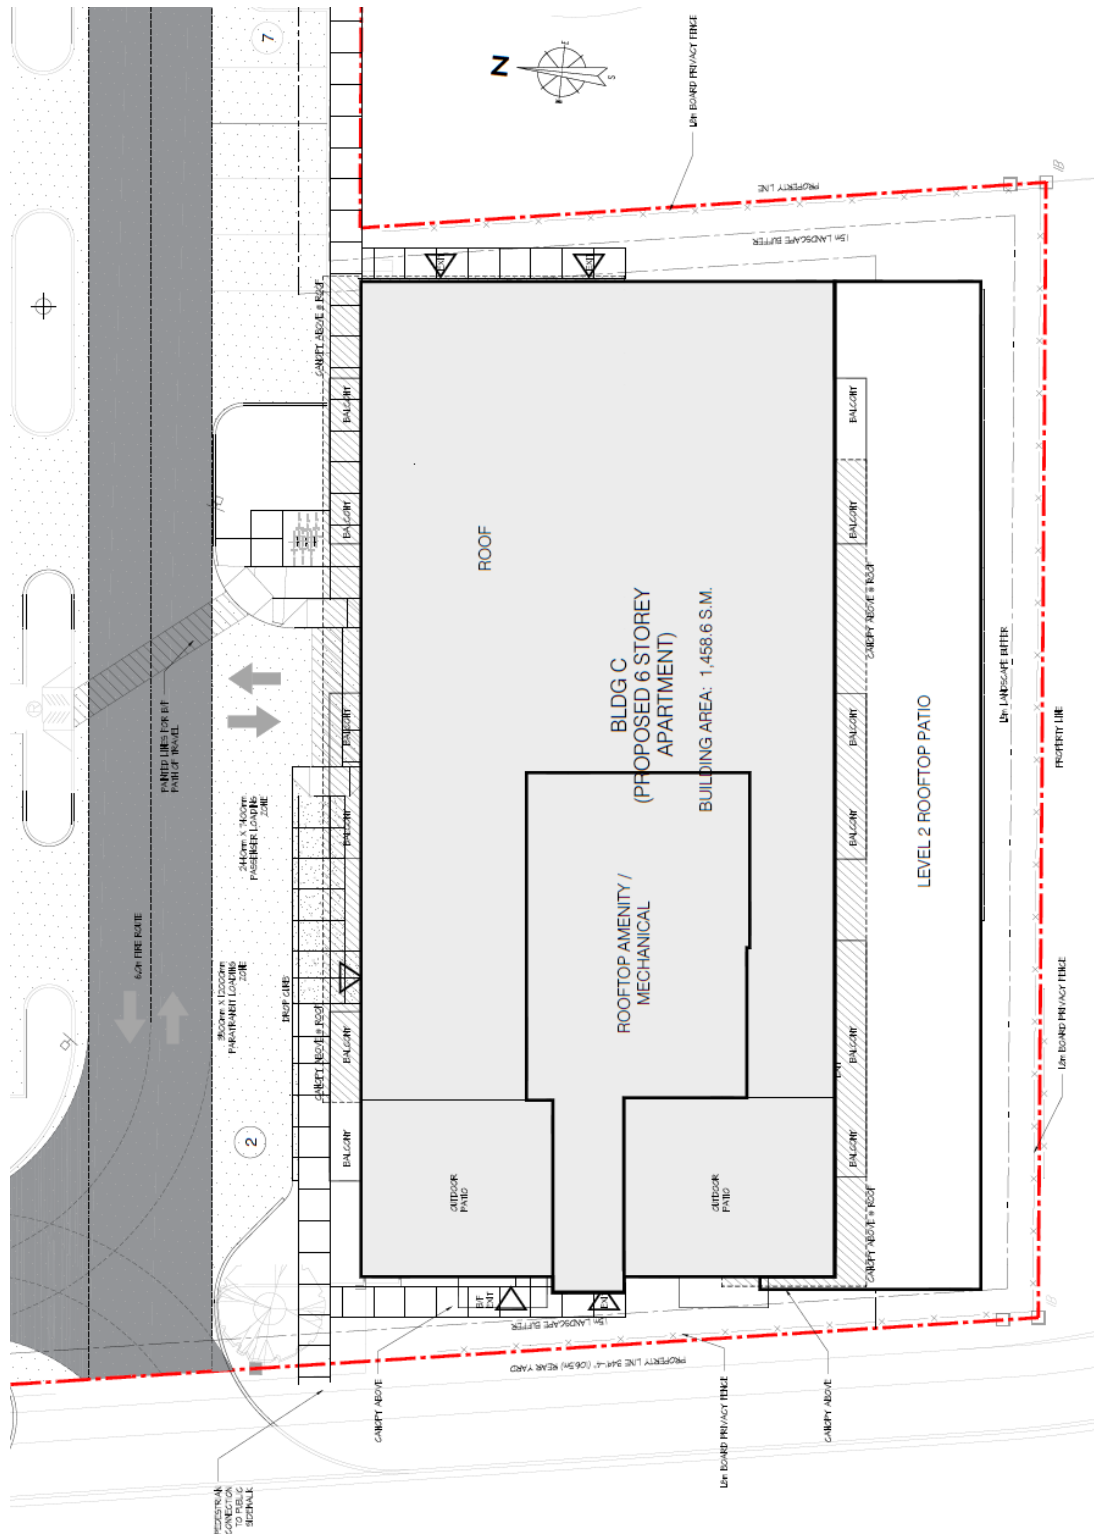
Conceptual Site Plan layout of proposed residential building within the Development Area
